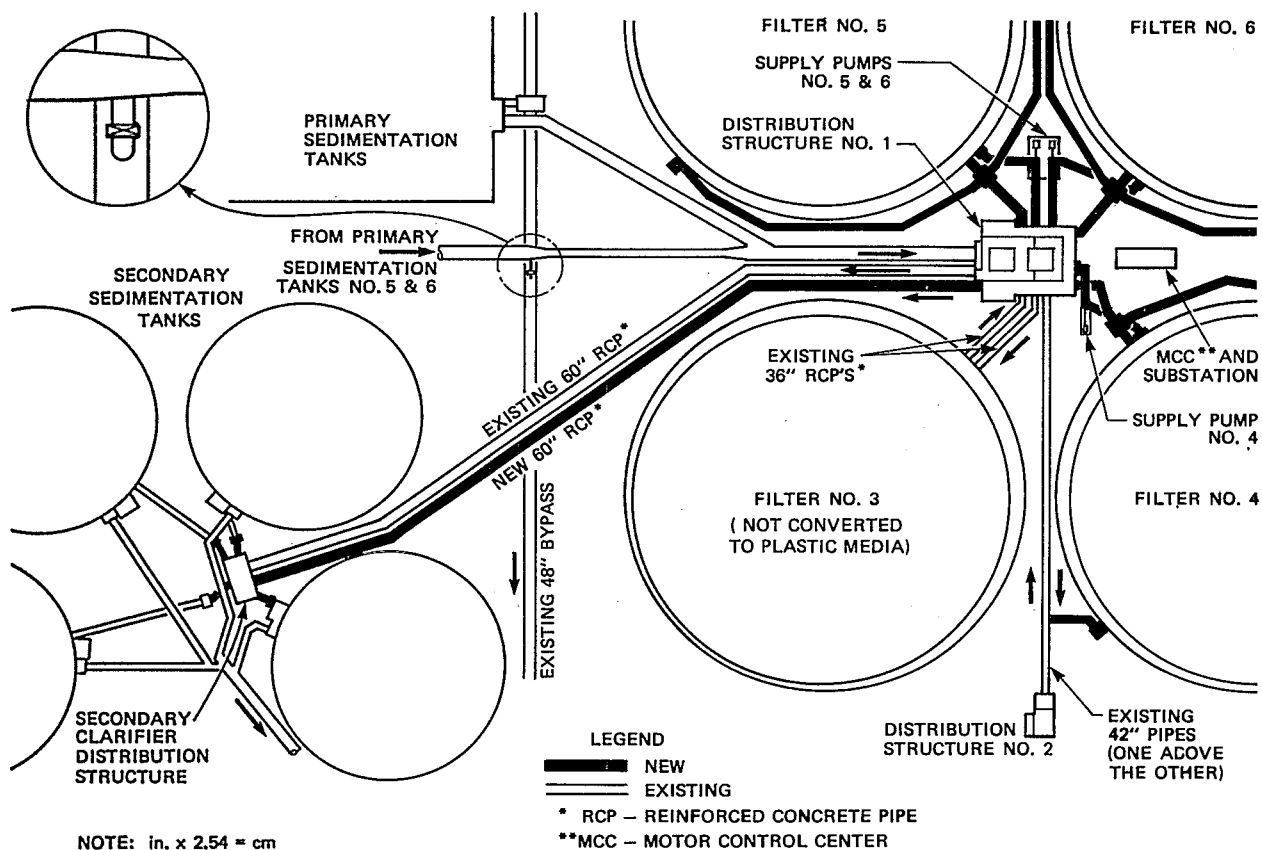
Piping diagram for upgraded secondary treatment facilities.
